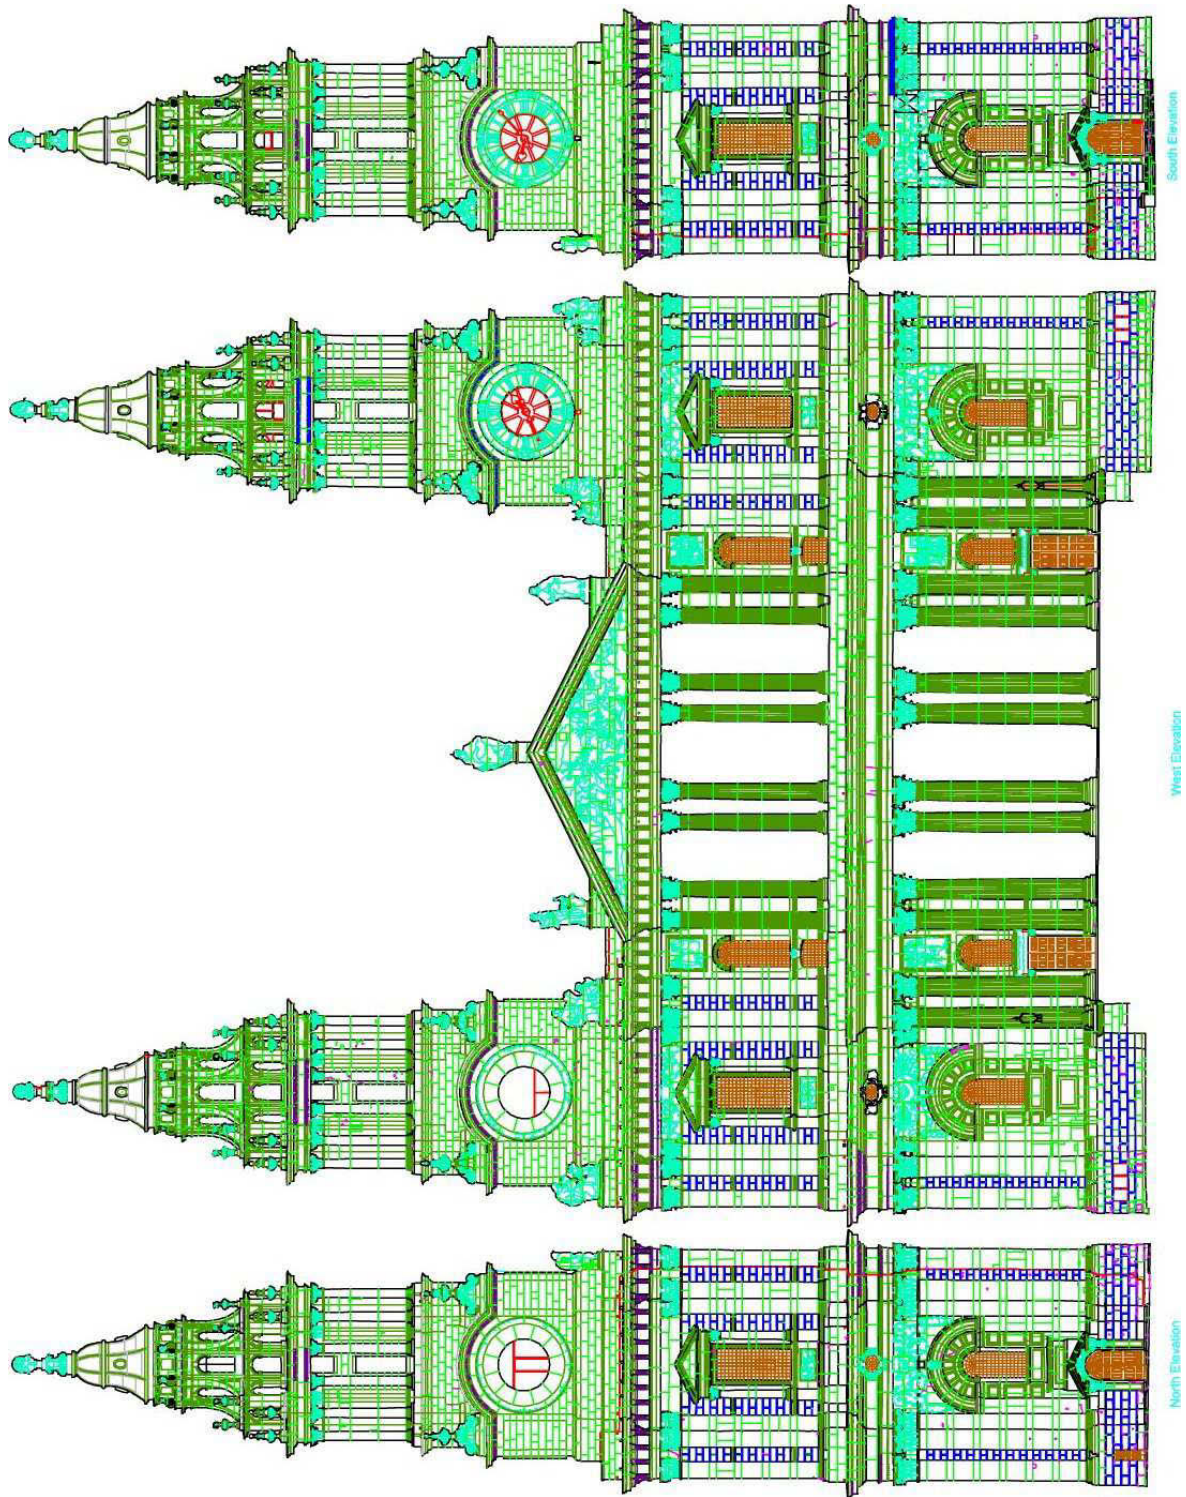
Extract from tender drawing 00-301B by Purcell Miller Tritton, showing the main west elevation and sides of the west towers
